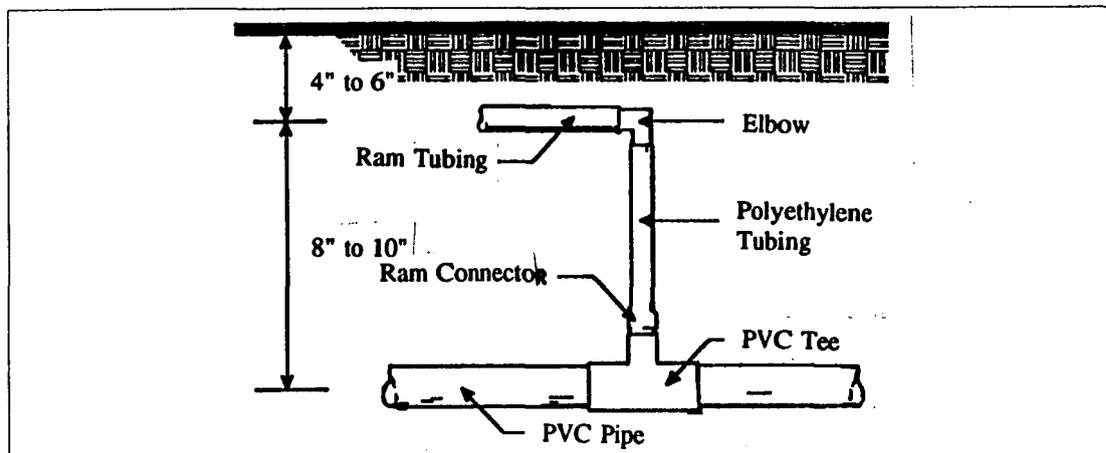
Ram Tubing Depth and Connection to PVC Lateral (Netafim Irrigation Equipment & Drip Systems, 1986, p. 6).
